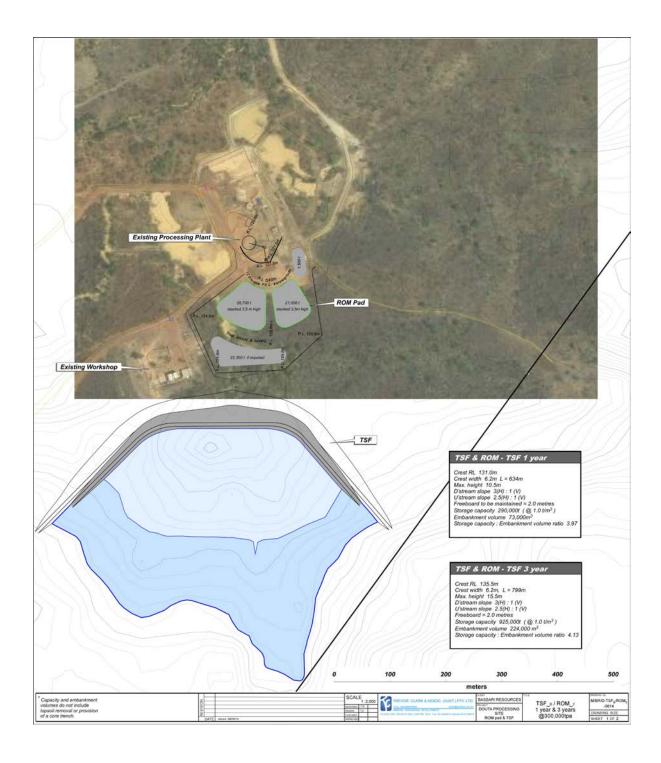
Tailings Storage Facility & ROM Pad Layout
